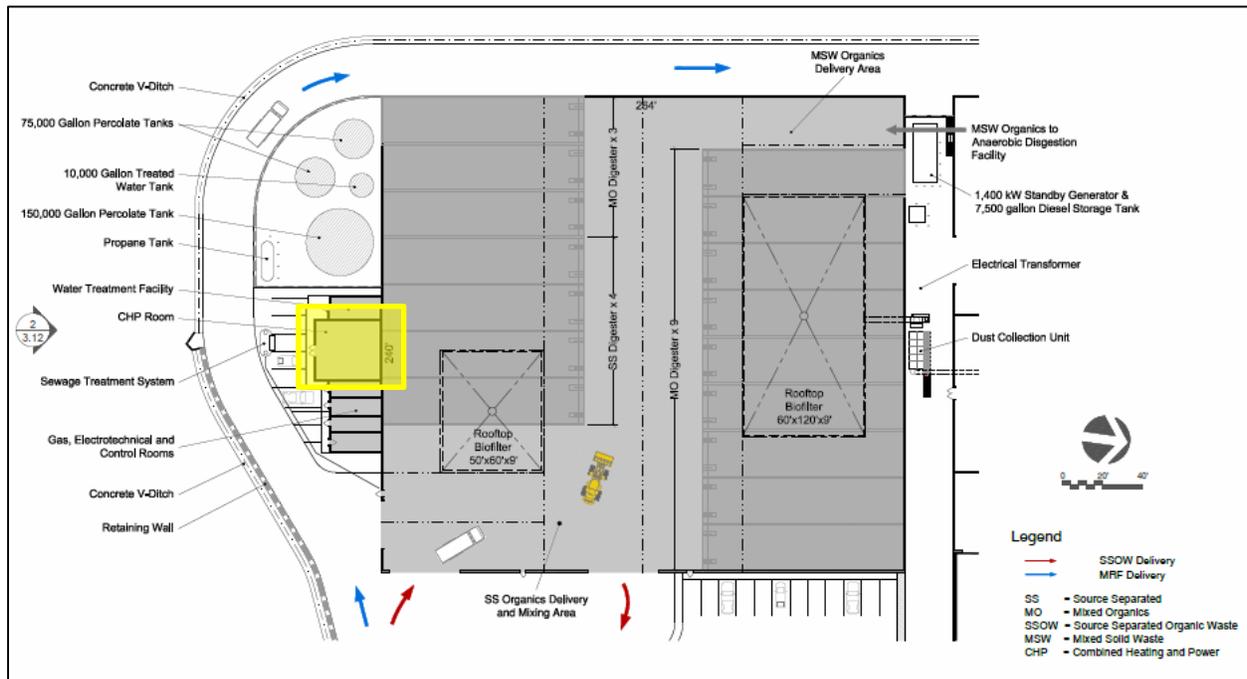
Plan View of the Proposed TRRP AD Facility (Source: County of Santa Barbara, 2013)
